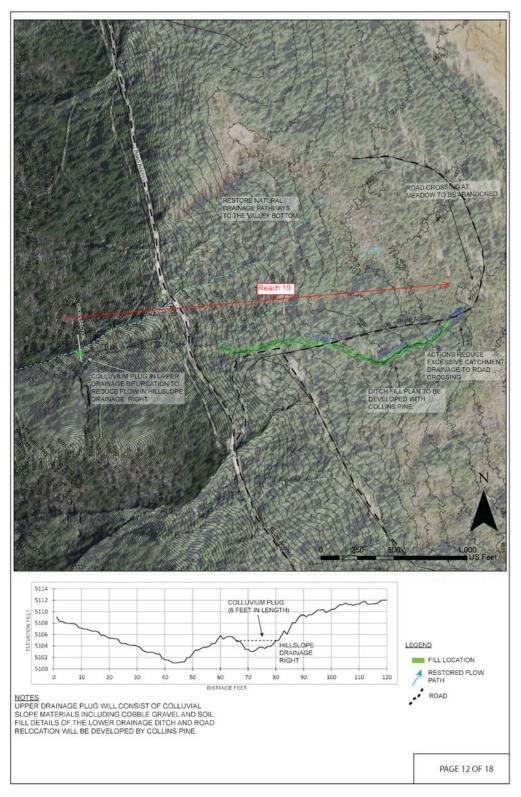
Design Plan View and Cross Section for Area 19 (A long section of ditch fill has been removed from proposed Project work)
